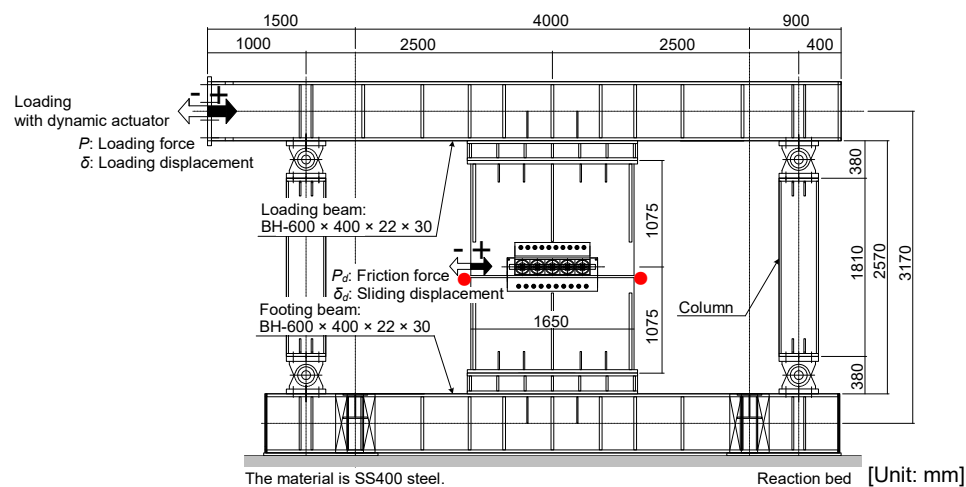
Elevation drawing of the steel beam-column loading frame in full-scale tests for Specimen S-3¹⁾
